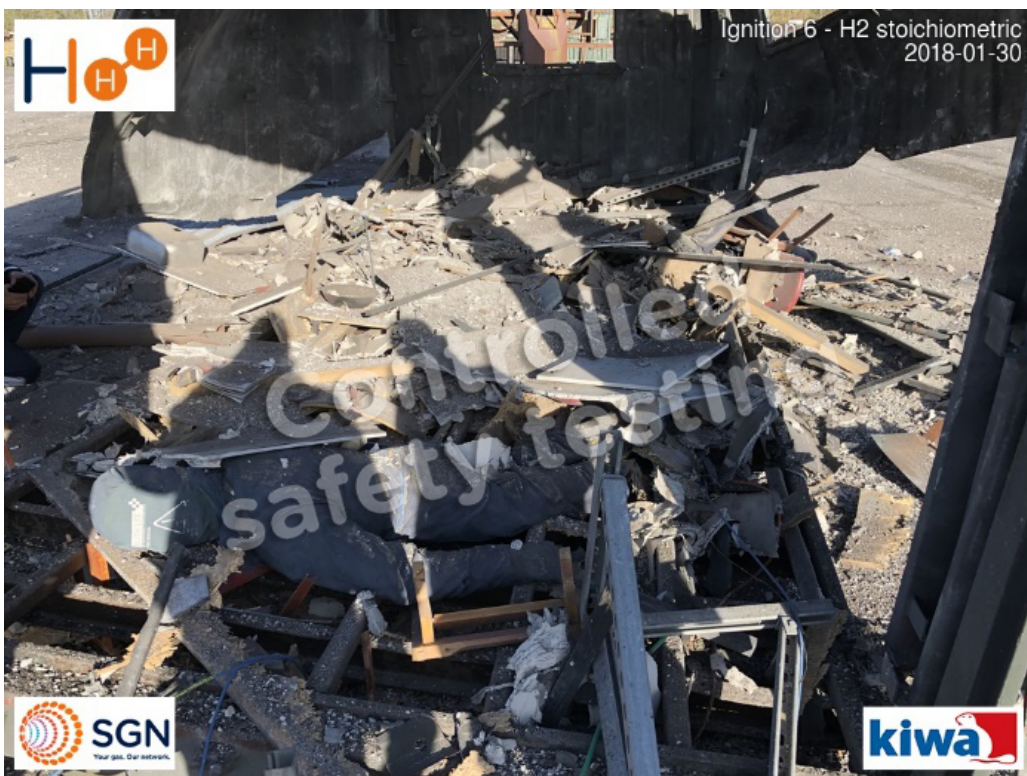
Close up of damage inside FIB showing collapsed ceiling, walls and floor, and 30kg dummy and broken chairs
